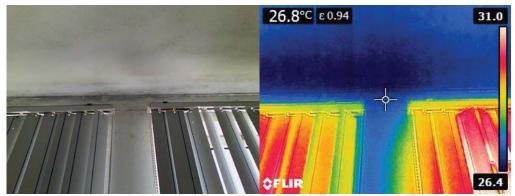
Thermal Images of thermal bridge in a classroom located the North sideat the ground floor.
